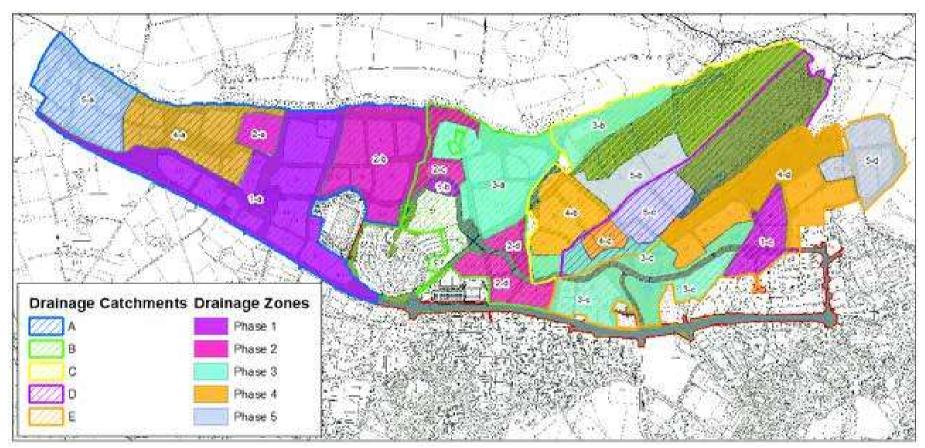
Plan showing the location of proposed drainage zones and development phasing areas
